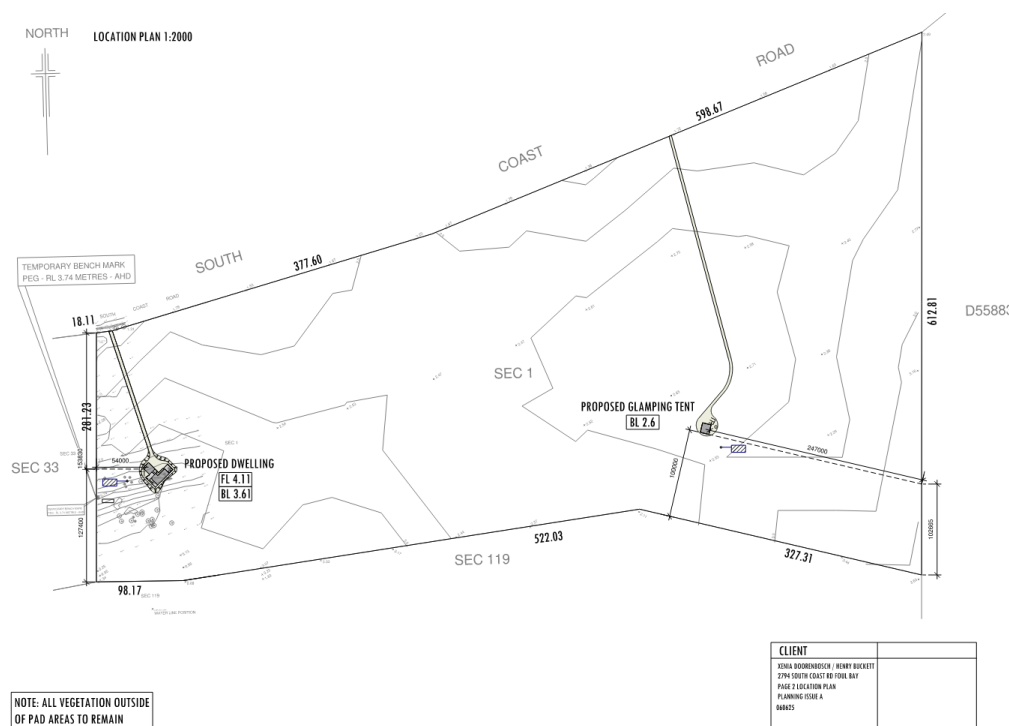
site plans of proposed glamping tent and location dwelling approved under DA 544/1086/2020.
